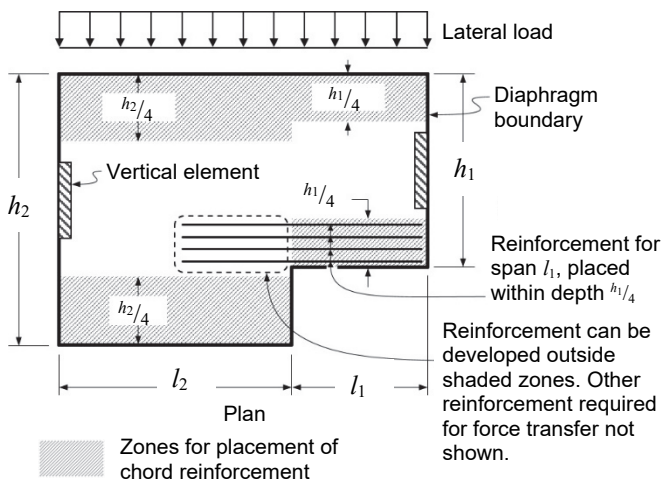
Locations of nonprestressed reinforcement resisting tension due to moment and axial force.
